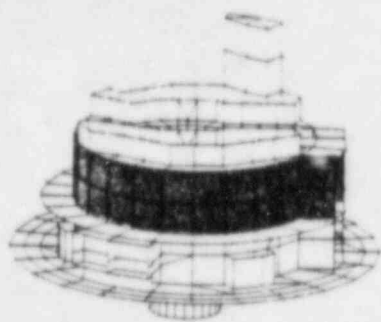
Perspective view of ring wall and fuel handling pool wall between El. 590 ft. and El. 617 ft.
